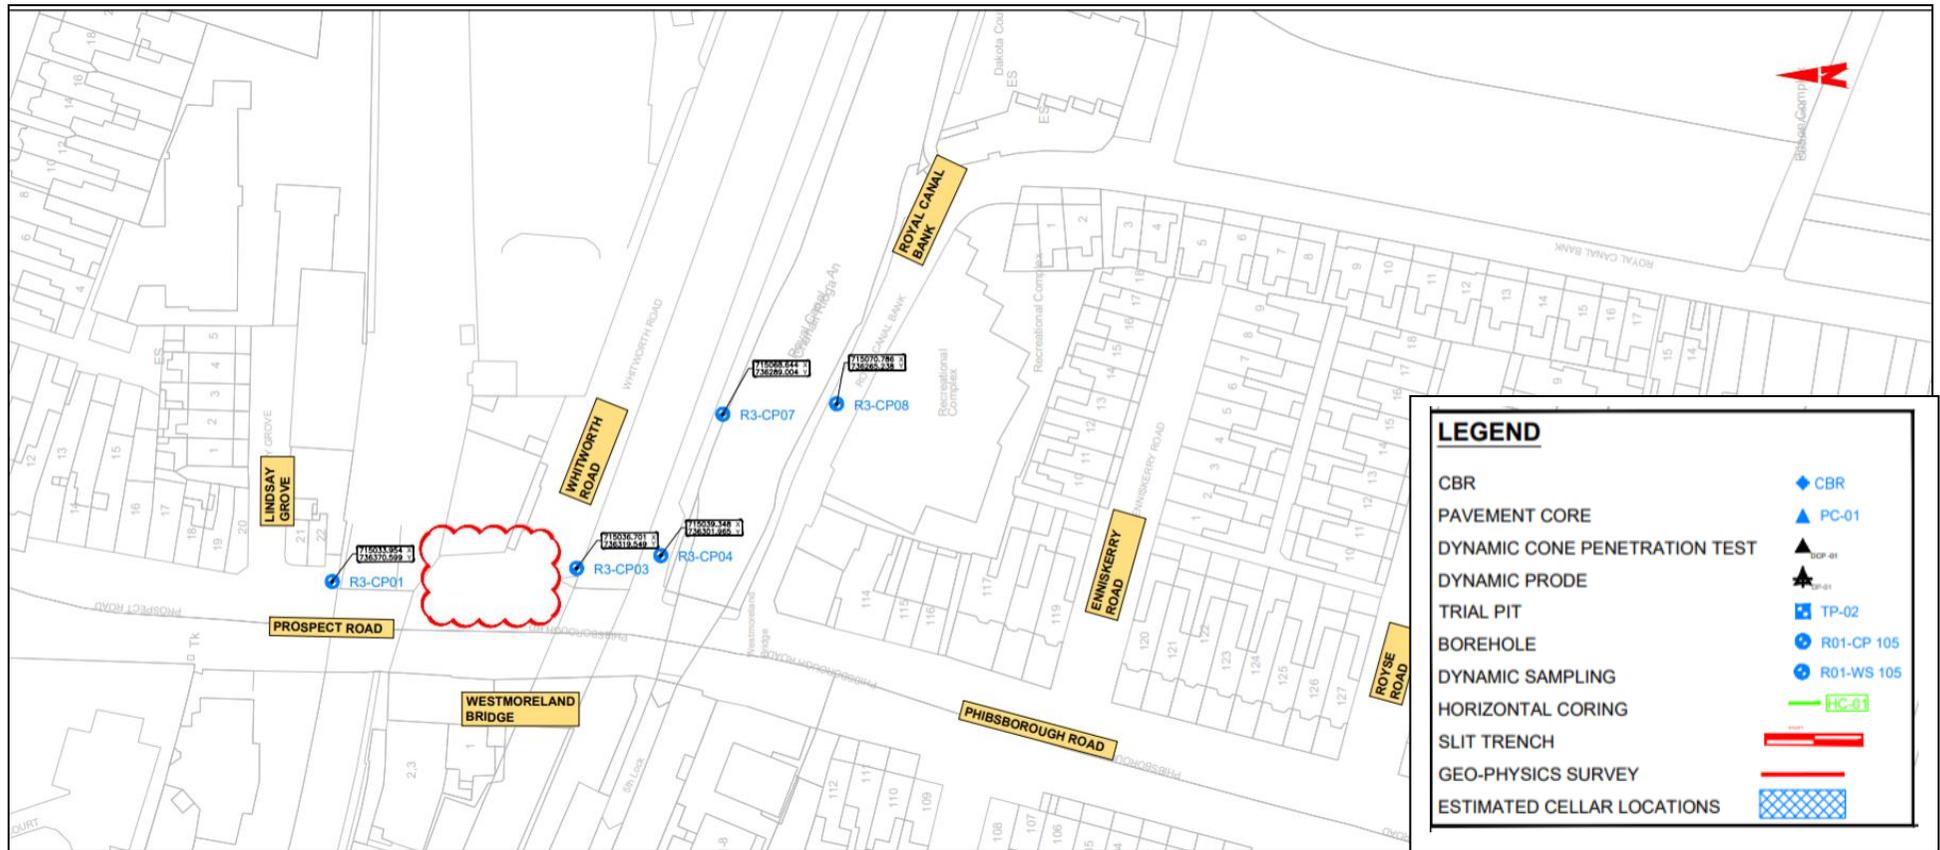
Extract from sheet 12 Route 3 GI works which comprise boreholes.
